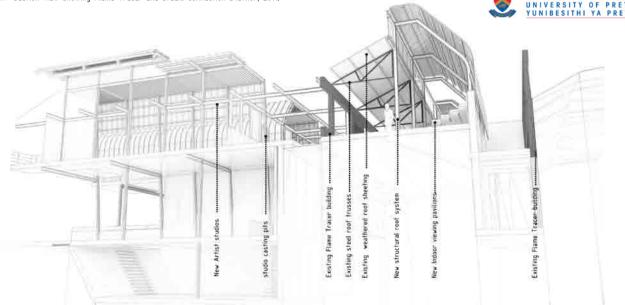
Section view showing Flame Tracer and studio connection (Author, 2011)
